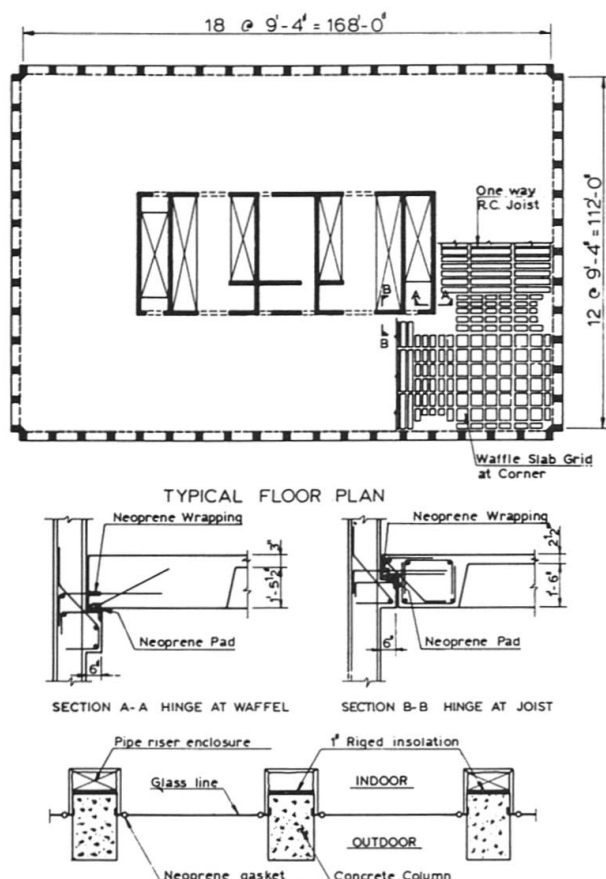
Typical floor plan, hinge details, and glass line of Brunswick Office Building
